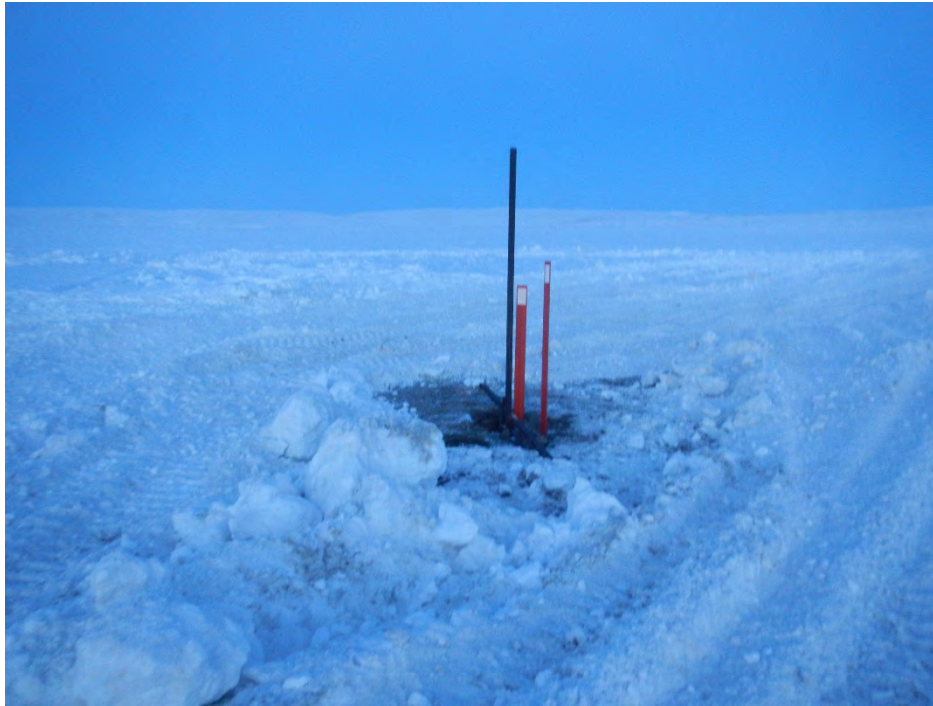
Post-Drilling Conditions at BH18-BR70-1, April 2018
